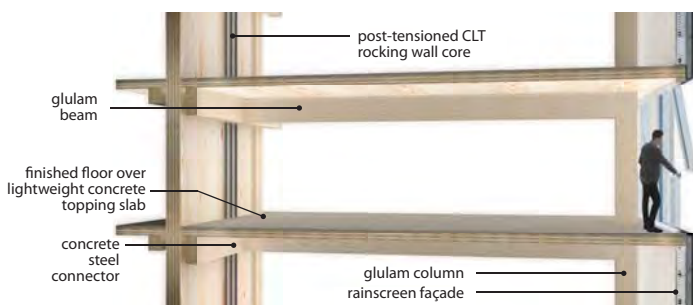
Framework glulam beam and rocking CLT wall connection. © LEVER Architecture
